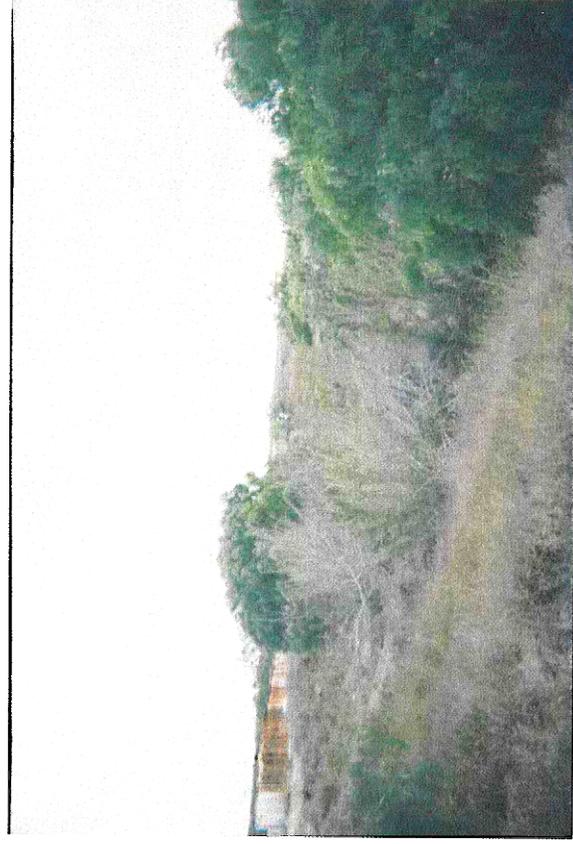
Typical view of the inner surface of the southern berm (area with side slope sloughing).
